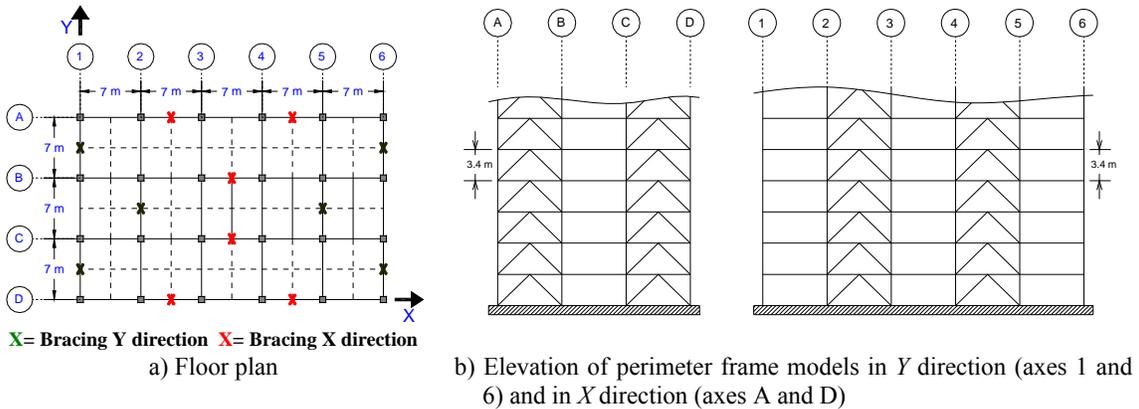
Floor plan and elevation view of the studied frames for T2 buildings
